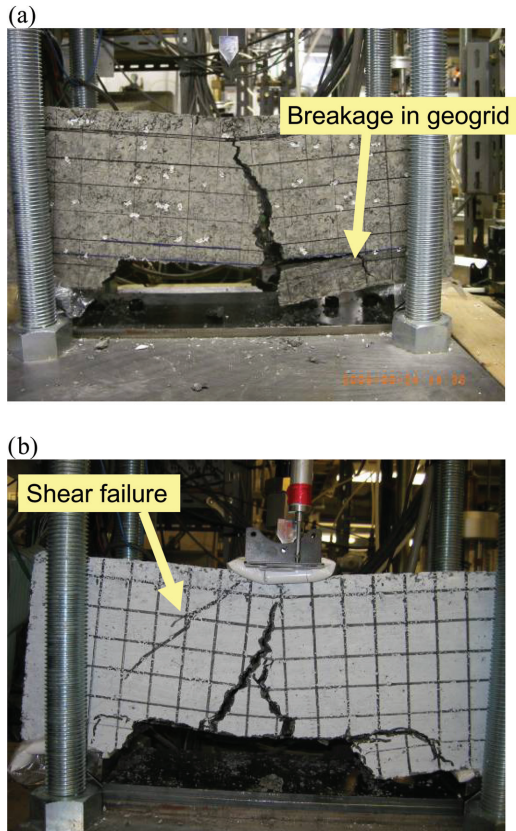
Ultimate failure of reinforced beam: a) breakage in geogrid ($c/g = 4\%$); and b) shear failure in backfill ($c/g = 2\%$).
